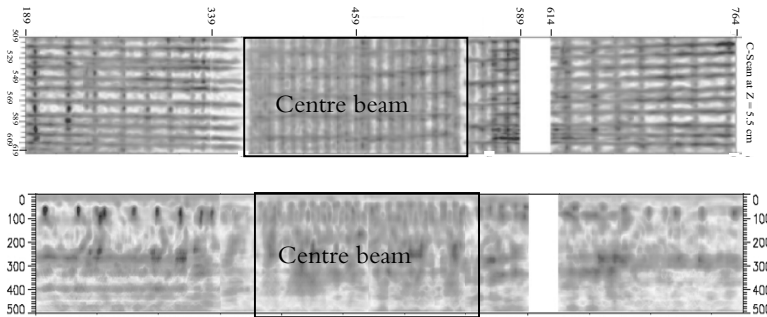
Upper: C-scan at depth 55 mm of a 110 mm wide and 575 mm long section aligned transversely to the bridge's centre line; Lower: D-scan of a 575 mm long line at the centre of the above seen C-scan, bottom of slab is at the top of the C-scan result.
